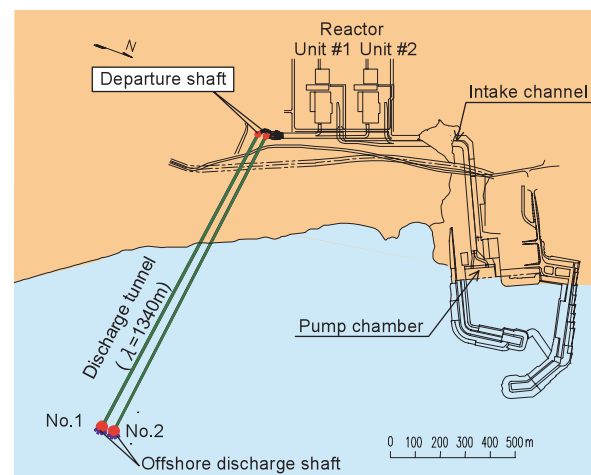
The Lungmen Nuclear Power Plant Plan No.4
